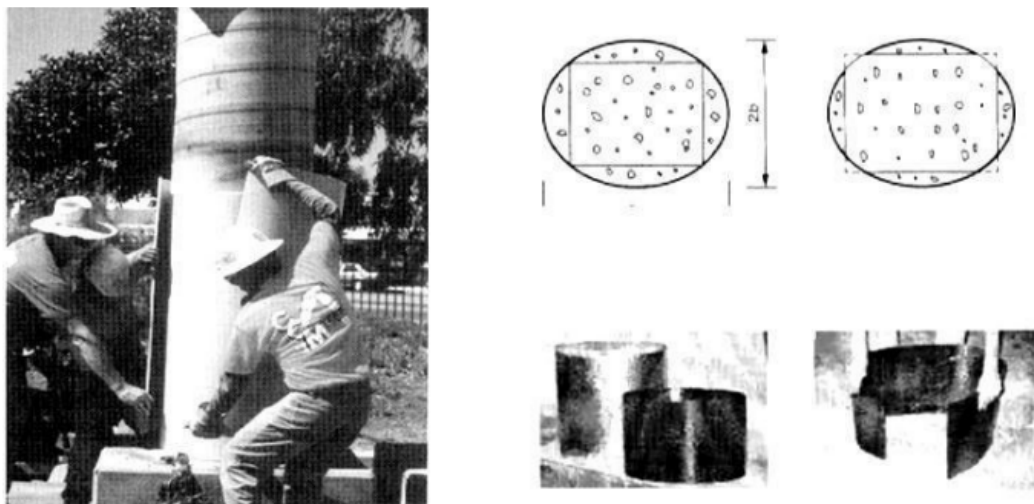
RC columns strengthened using prefabricated FRP shells (Monti 2003).
